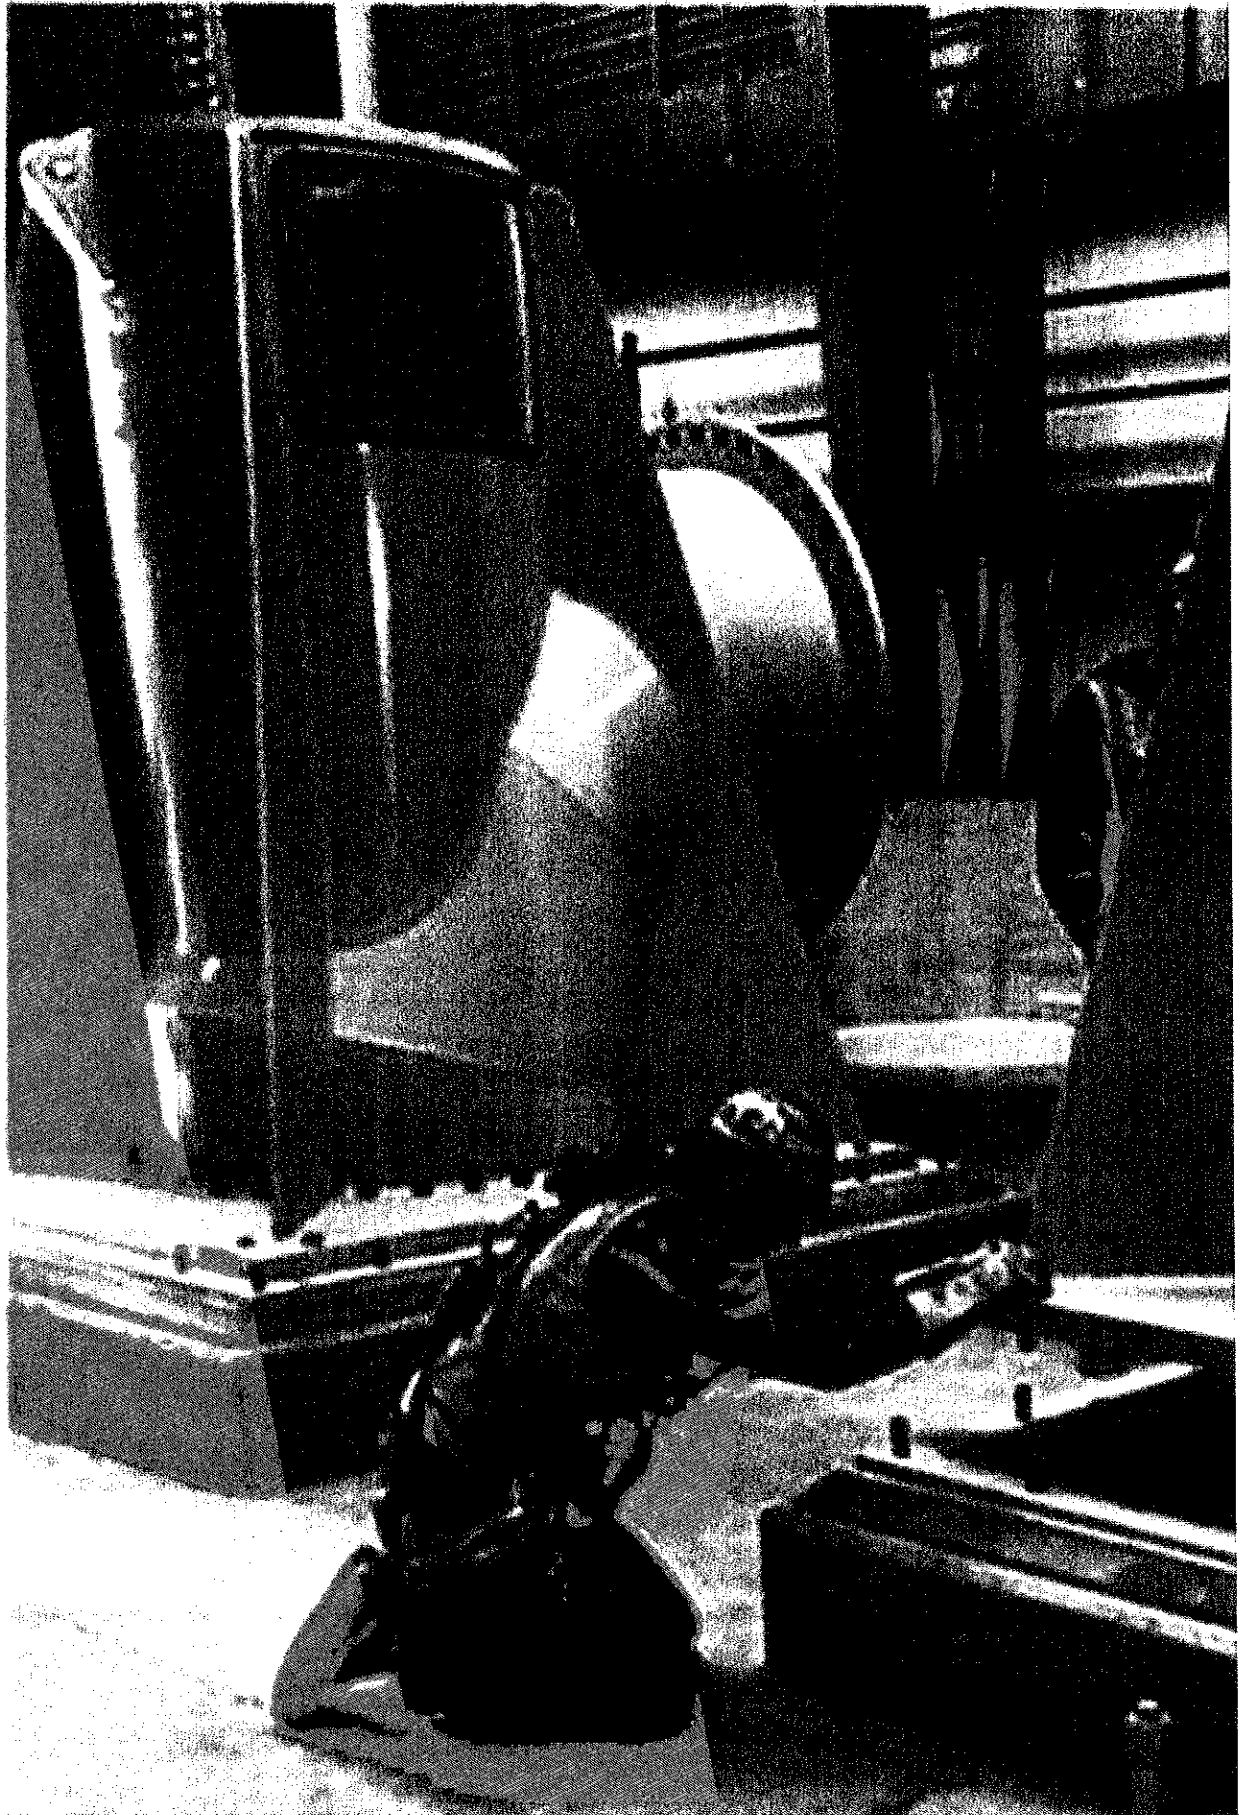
Guiding the pump base plate onto the pump pedestal anchor bolts.
